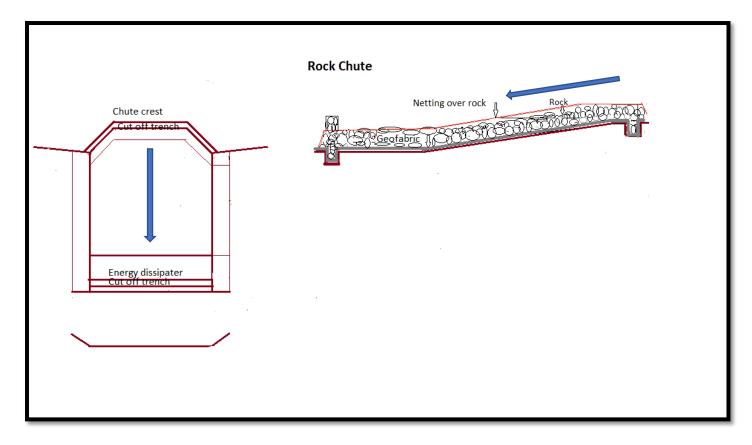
Example rock chute design – (left) aerial view; (right) cross section.
